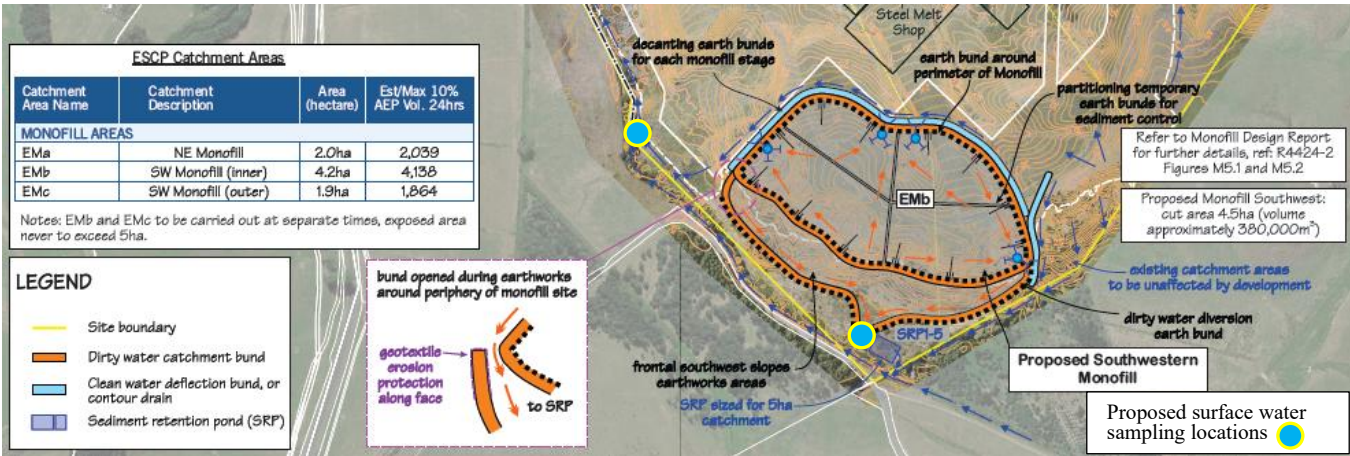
monofill in the southwestern portion of the Green Steel site, showing stormwater containment bunds, stormwater retention pond (SRP) and *dirty* and *clean* water direction channels. Proposed surface water sampling locations are also shown.
